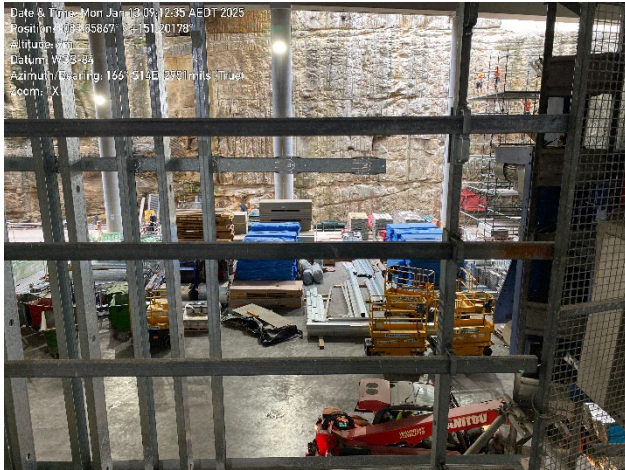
Tidy housekeeping of material stockpiles. View from second floor materials hoist.
